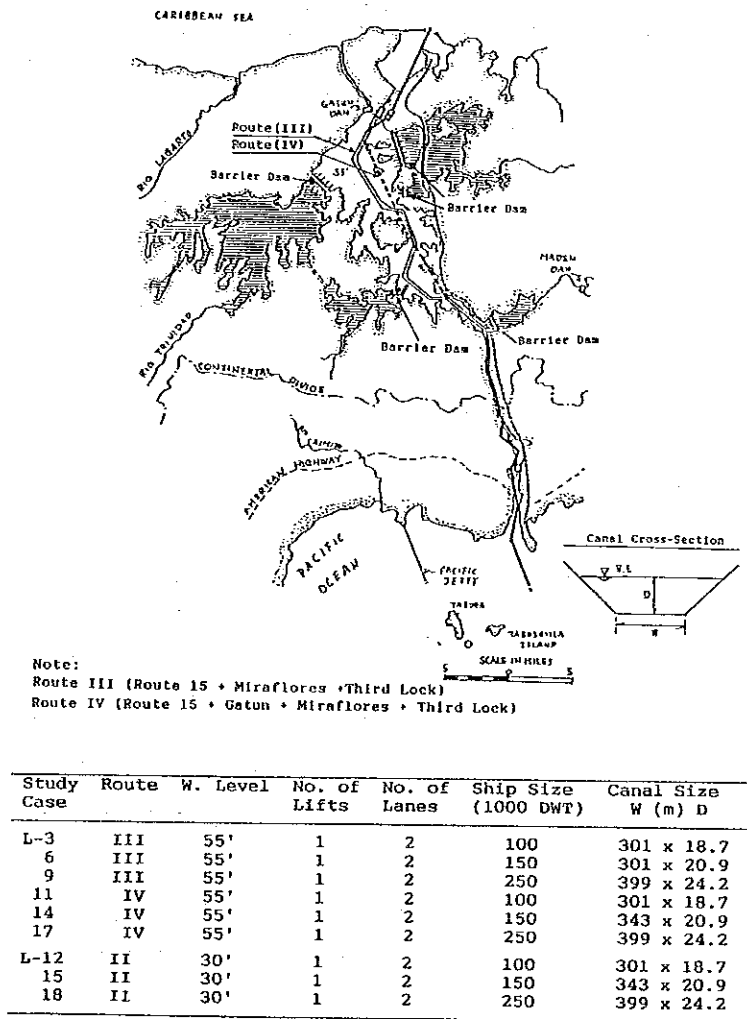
Layout of Low Rise Lock System for Route III and IV
